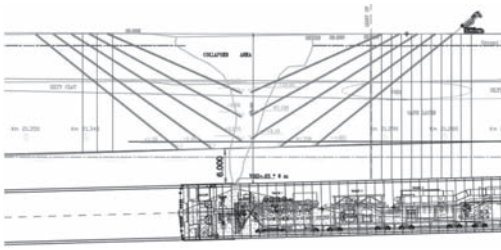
Compaction grouting above the collapse area—longitudinal section (Patrizi).
